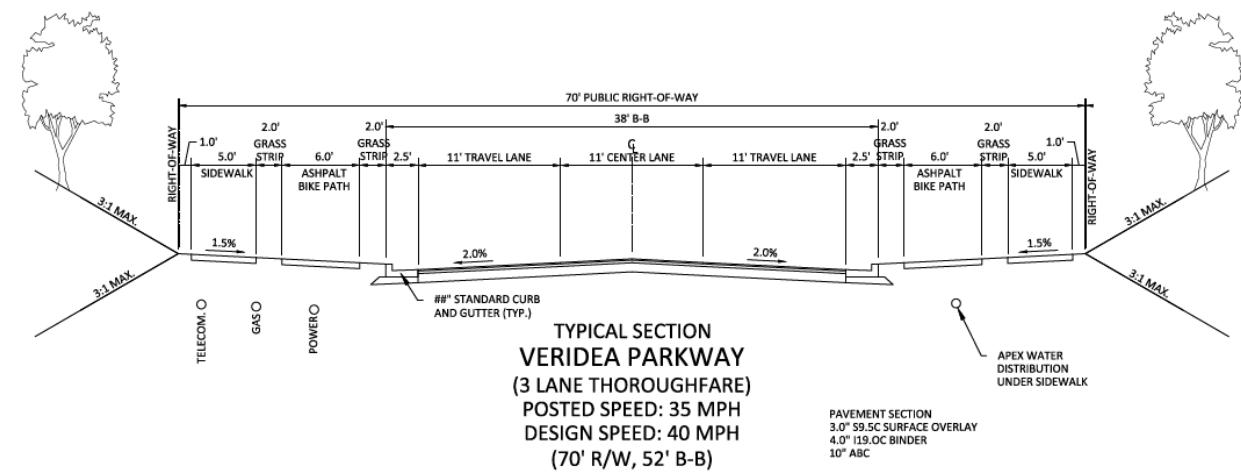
Typical Section for Veridea Parkway (3-lane) showing separated bicycle lane and sidewalk
